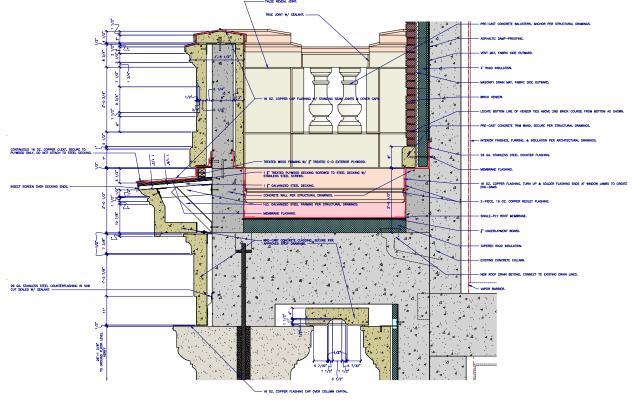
N-S Section of Portico Corrective Work Between Columns
